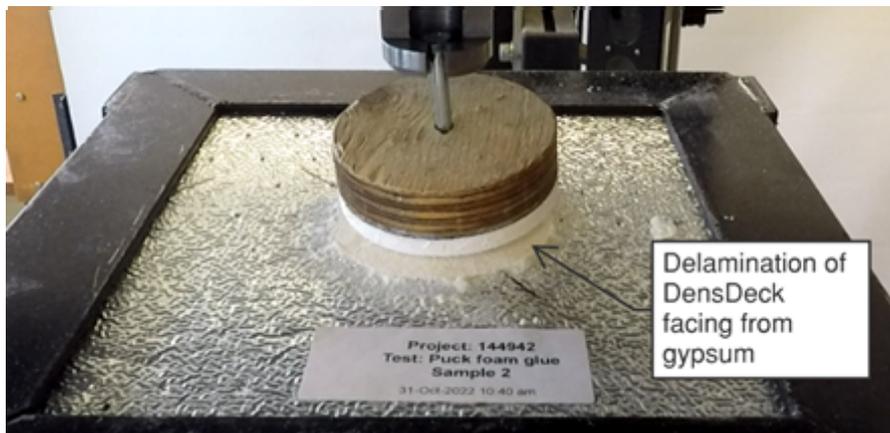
Viking Soudafoam pull off test specimen after loading
